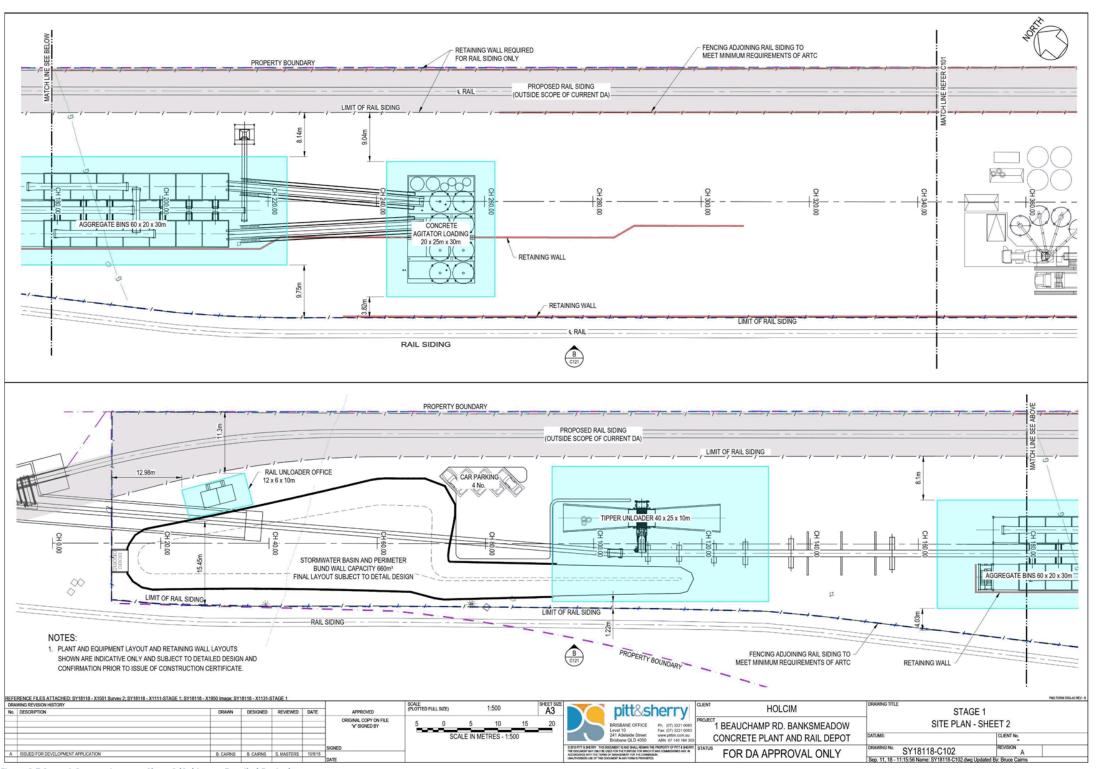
Stage 1 Concept Layout – Sheet 2 (Subject to Detailed Design)
